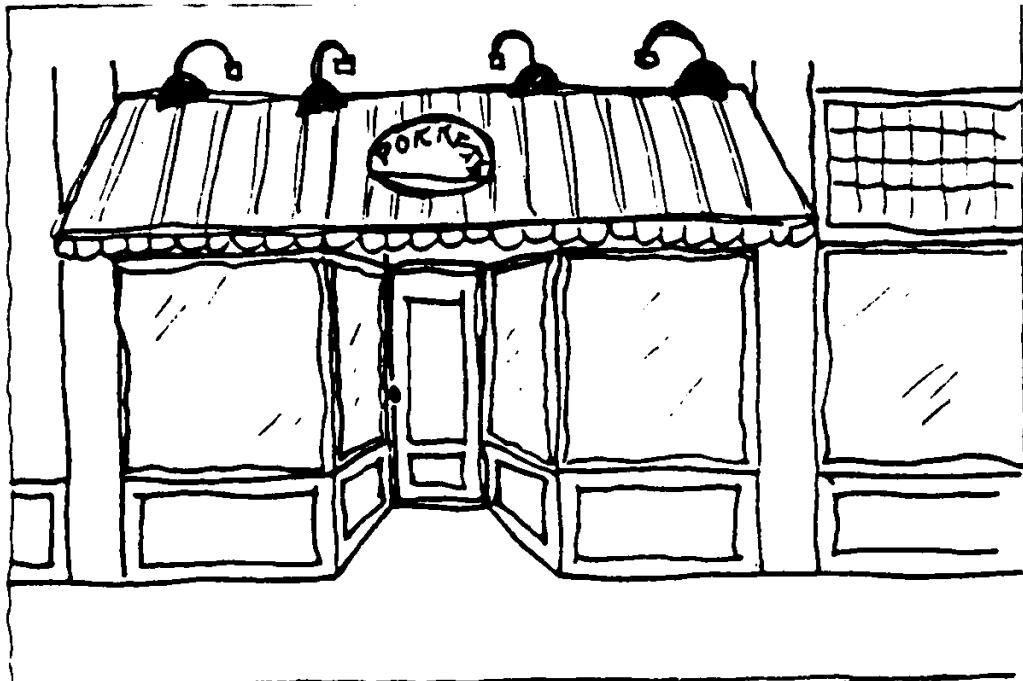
Lighting fixtures attached to a building should be architecturally compatible with the facade of the building.
